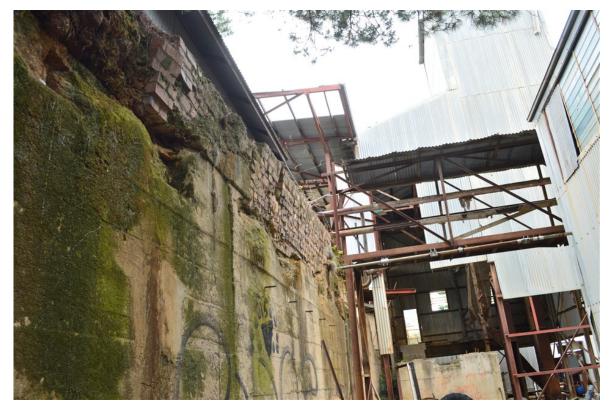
Concrete top and upper masonry work to the retaining wall partially collapsed. (Source: GML, 2016)
